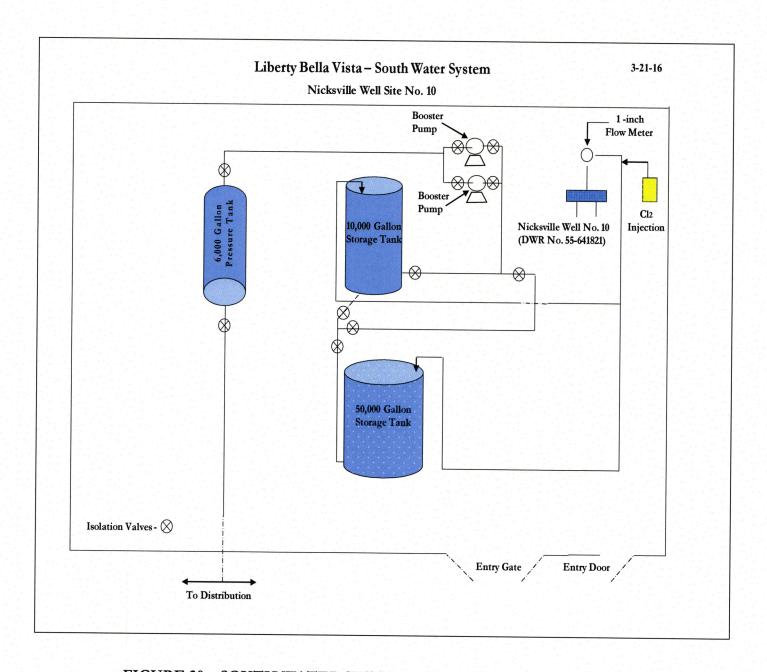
SOUTH WATER SYSTEM NICKSVILLE WELL SITE NO. 10
